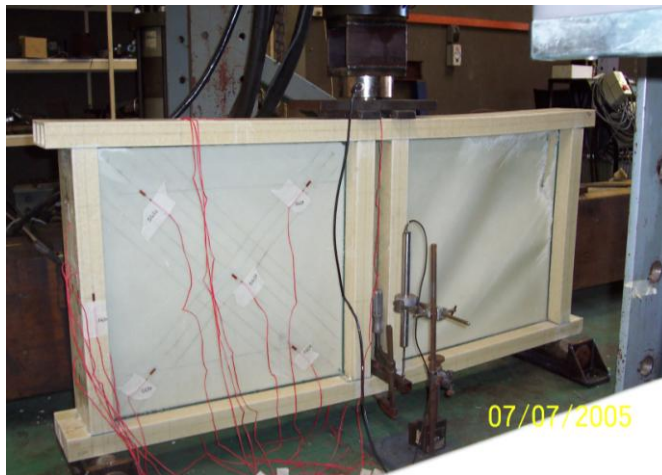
Modular fibre composite truss panel (Omar, 2008)
